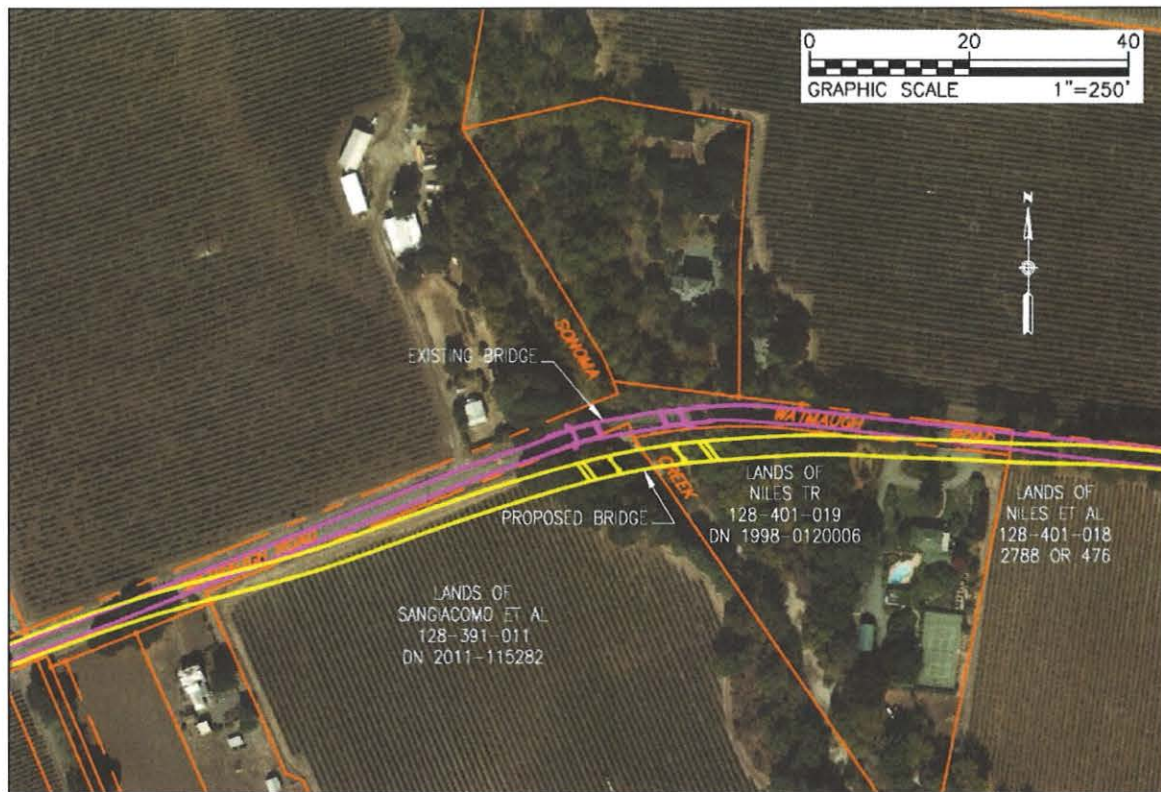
Aerial showing the alignment for Alternative 3, constructing a new bridge downstream, June 2018.
